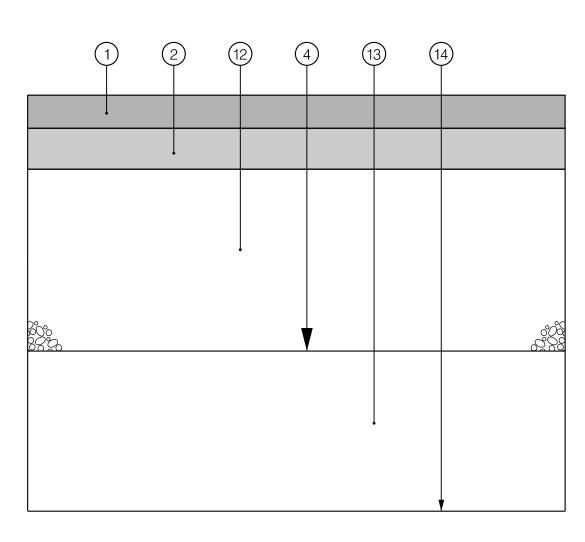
DETAIL C CONCRETE SIDEWALK ROCKVILLE PIKE (MD 355) OLD GEORGETOWN ROAD (MD 187)
